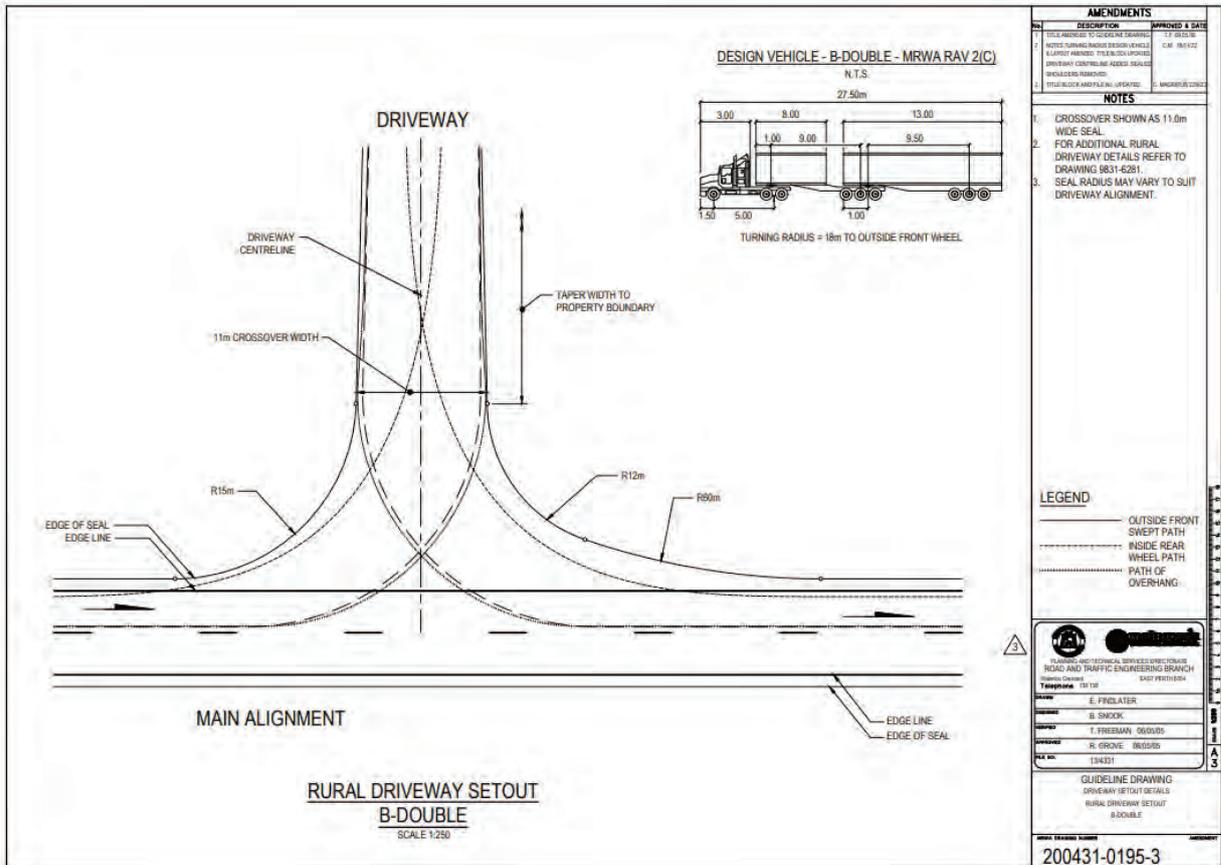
MRWA layout details for a rural driveway (B-Doubles up to 27.5 m)
